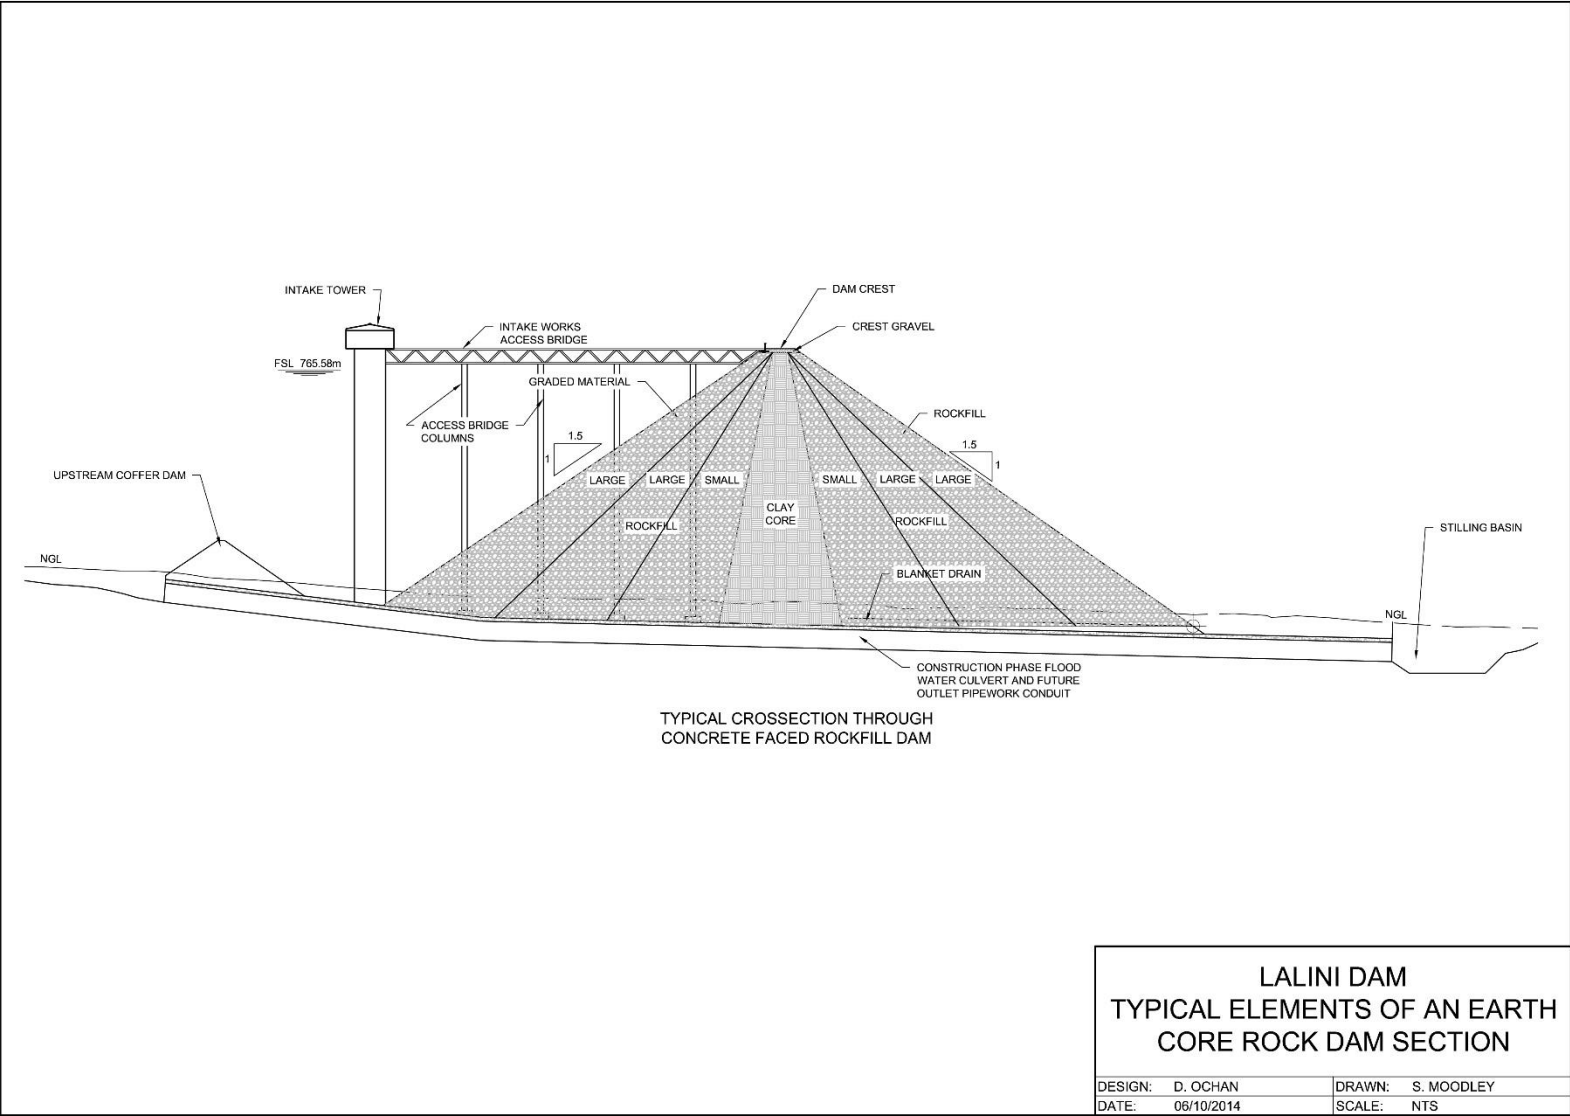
Typical Sections and Details for ECRD Type Dam
